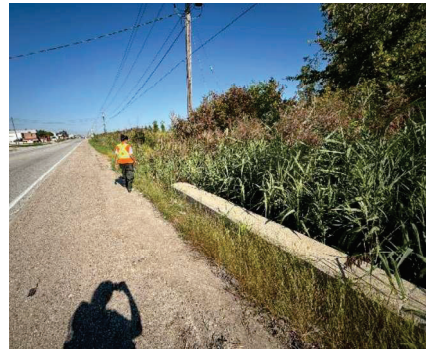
Facing northwest at Crossing 3, from the north side of County Road 46.
